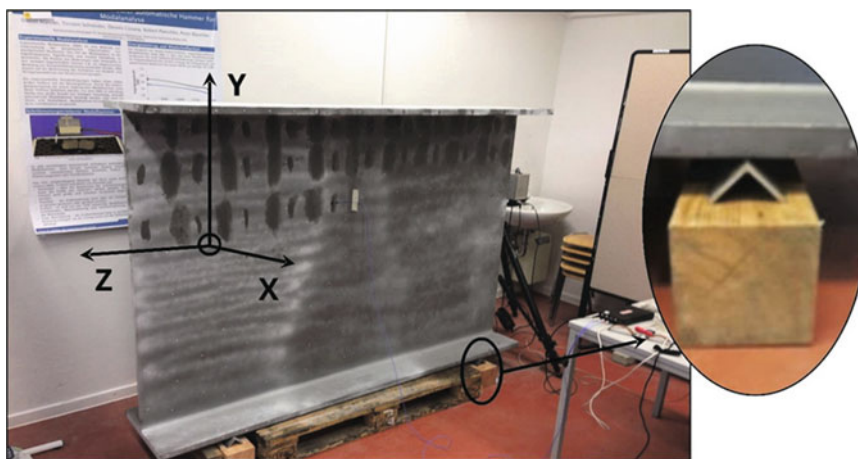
(Left) Accelerometer modal test setup on runway beam section. (Right) Zoomed view of the runway beam section supports
